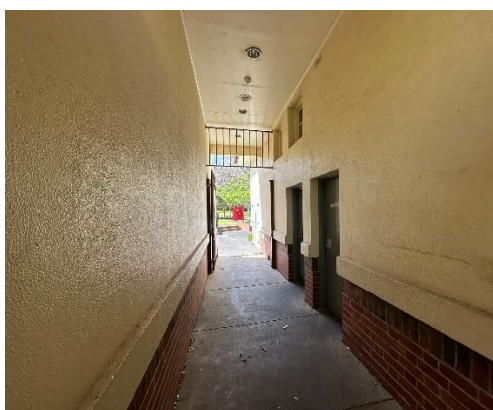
Existing corridor to the southeast corner of the School Building, with entrance to store rooms to the left (1990's portion of building) and male amenities to the right (1928 portion of building). Source: NBRS, 2024.
